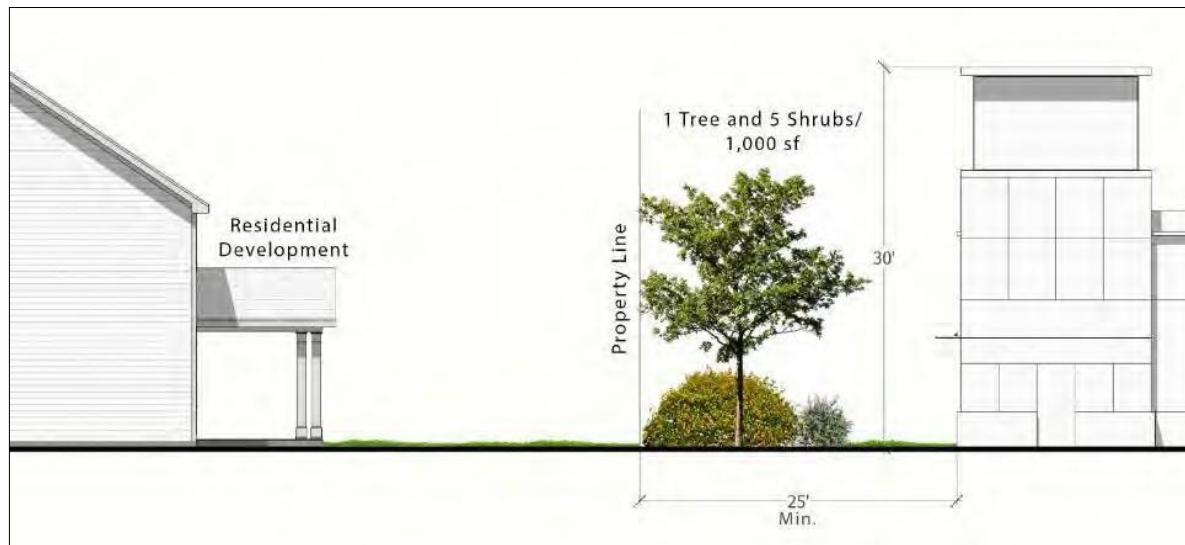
Building transitions for commercial buildings 35 feet or less in height that are adjacent to residential development.
